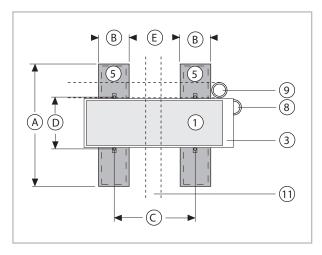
Dimensions for the strip foundation (bird's eye view)
